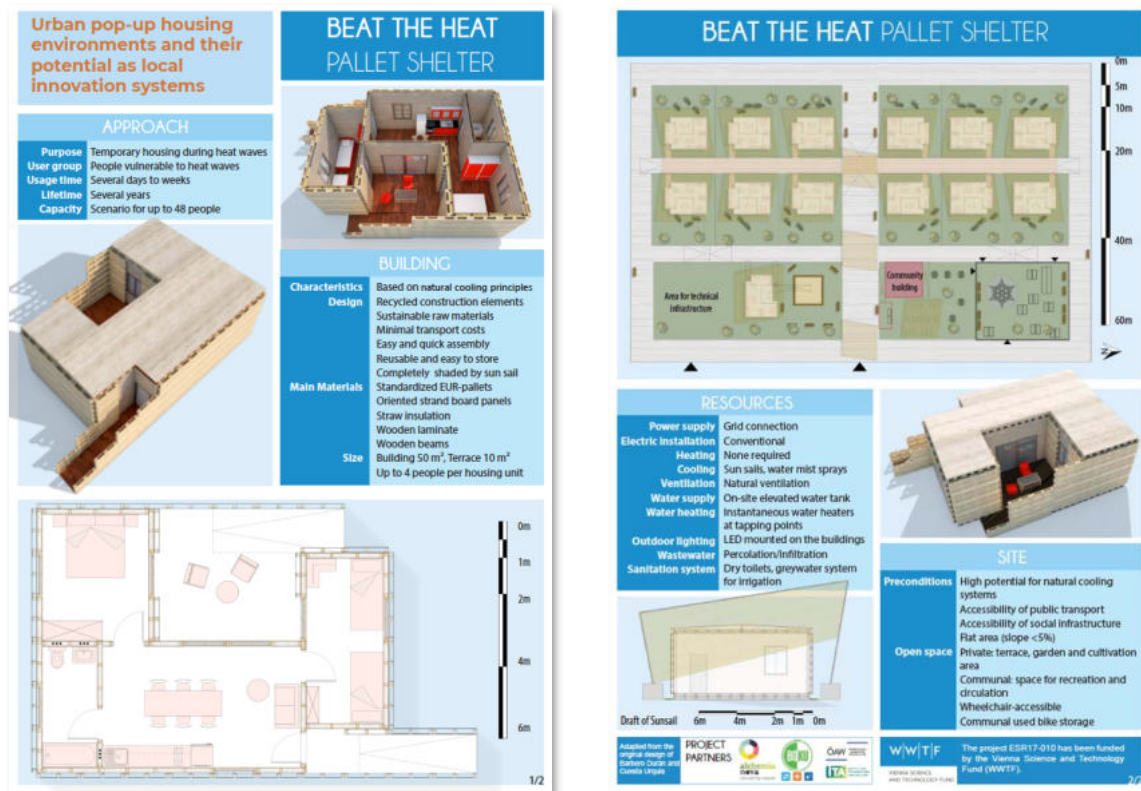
Fact Sheet: Beat the Heat - Pallet Shelter
